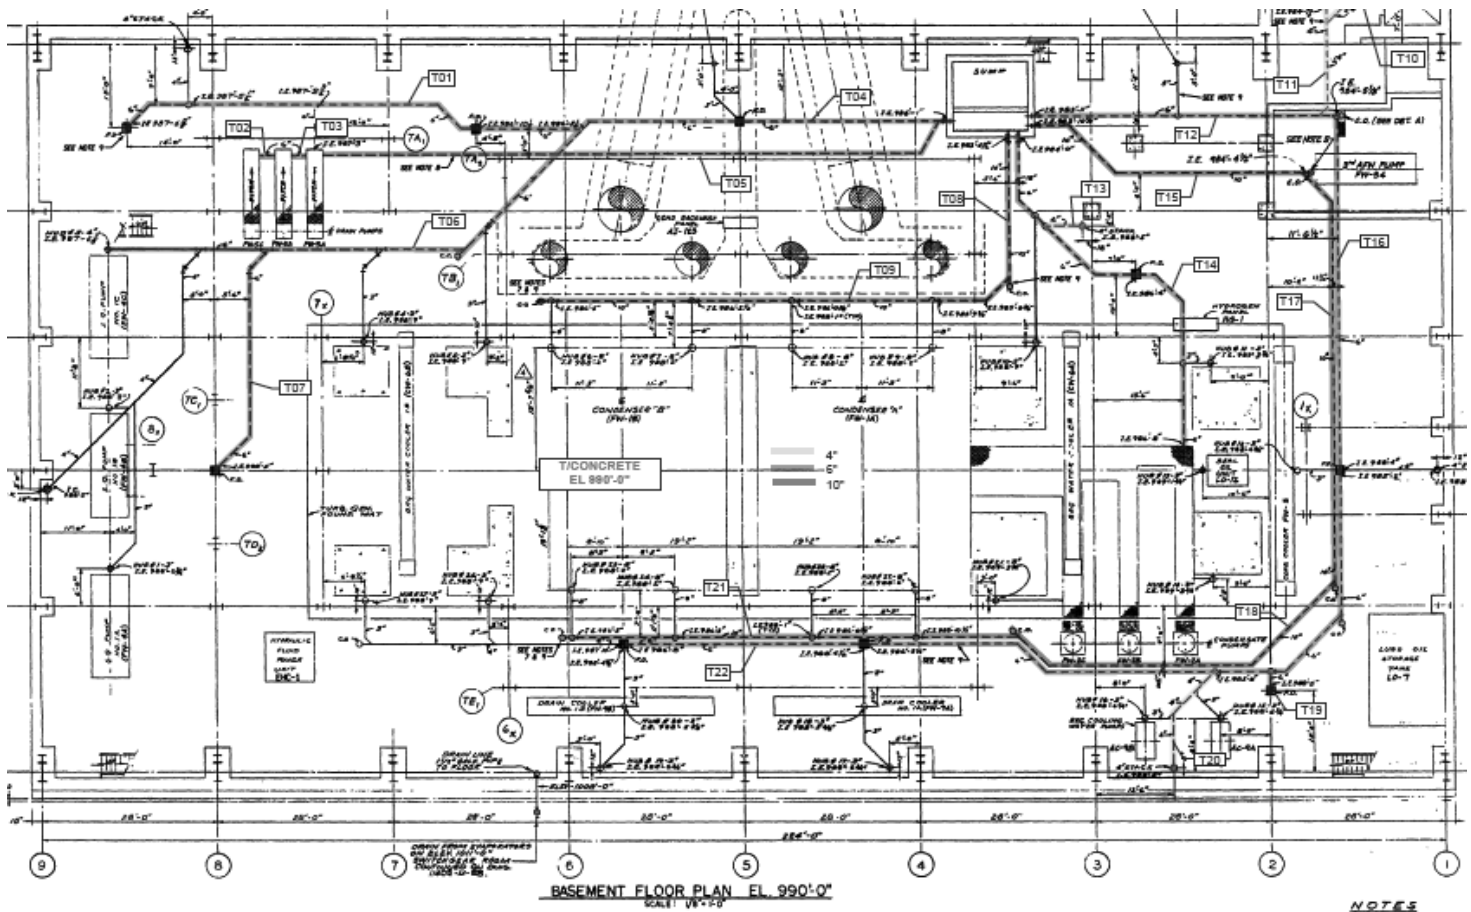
Embedded Turbine Building Drain Piping to Remain (10768)
